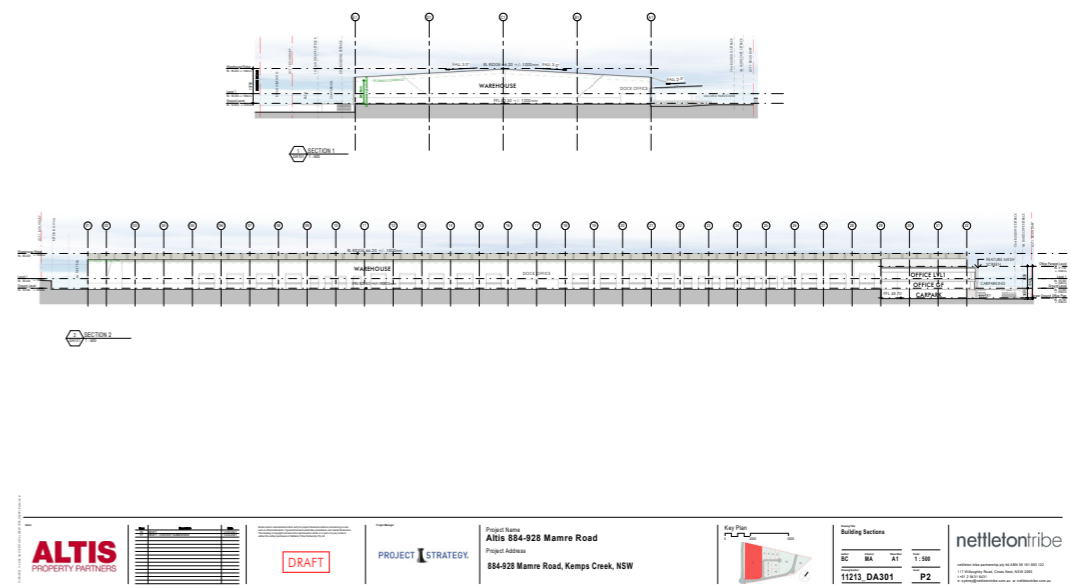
Typical Warehouse Sections - (Source: Nettletontribe)
